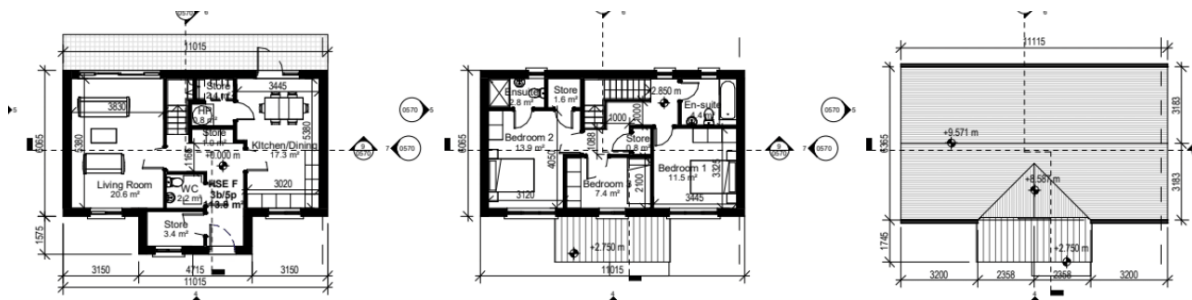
Ground (left) first (middle) and roof (right) plans of House Type F
